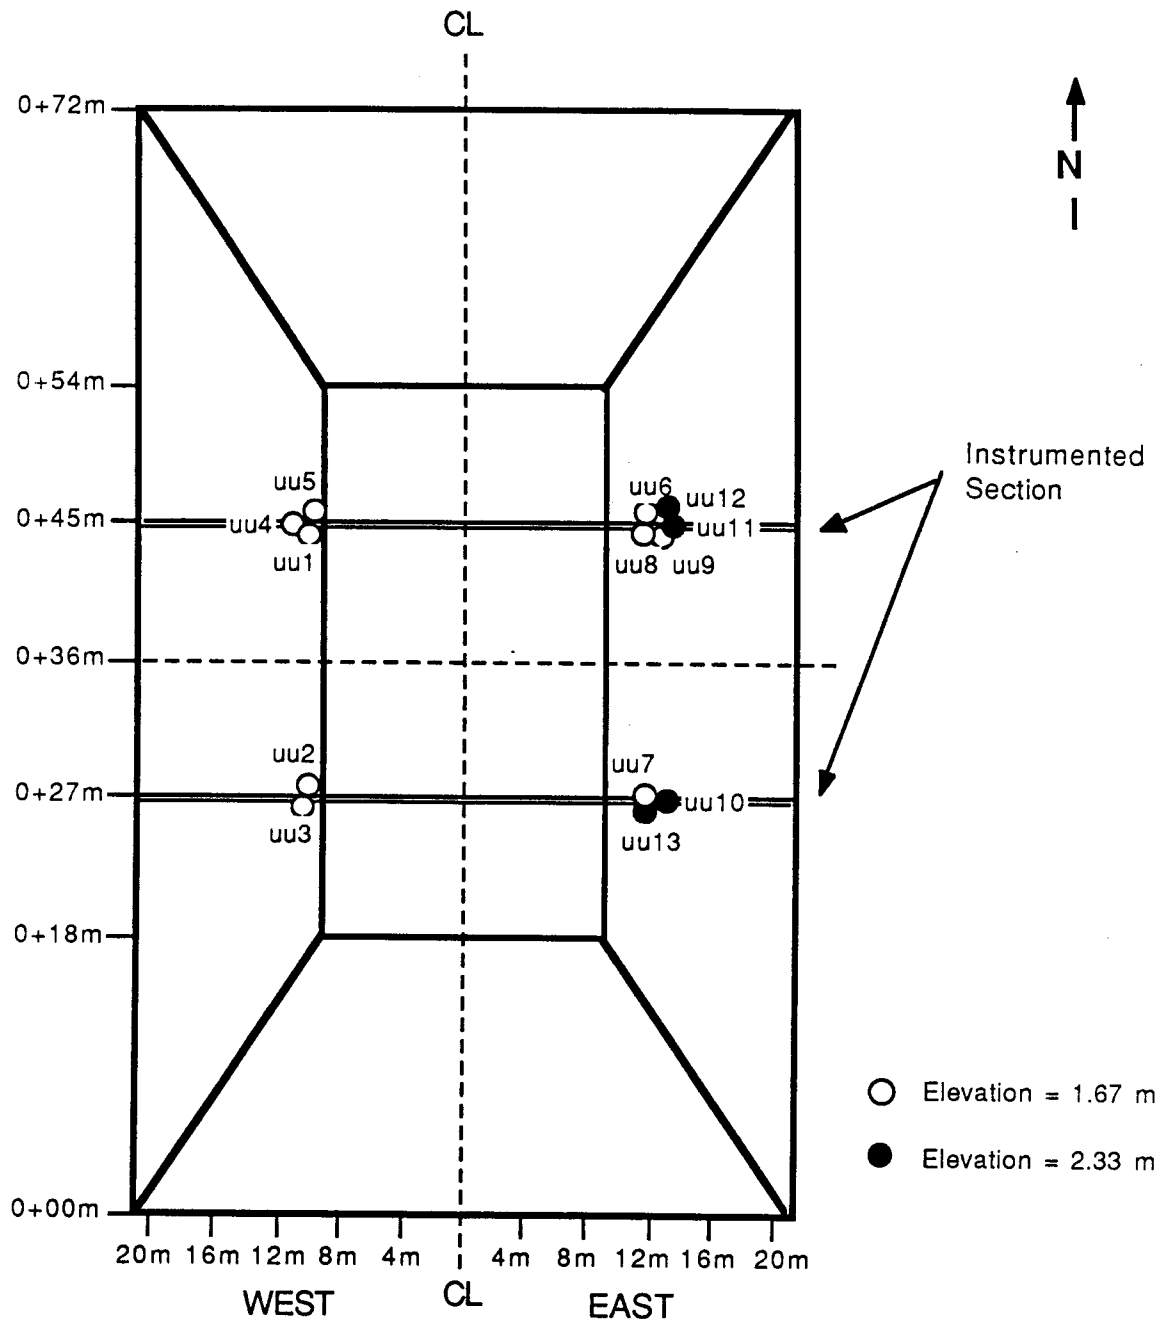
Plan View of Test Fill Indicating Location of Tube Samples
